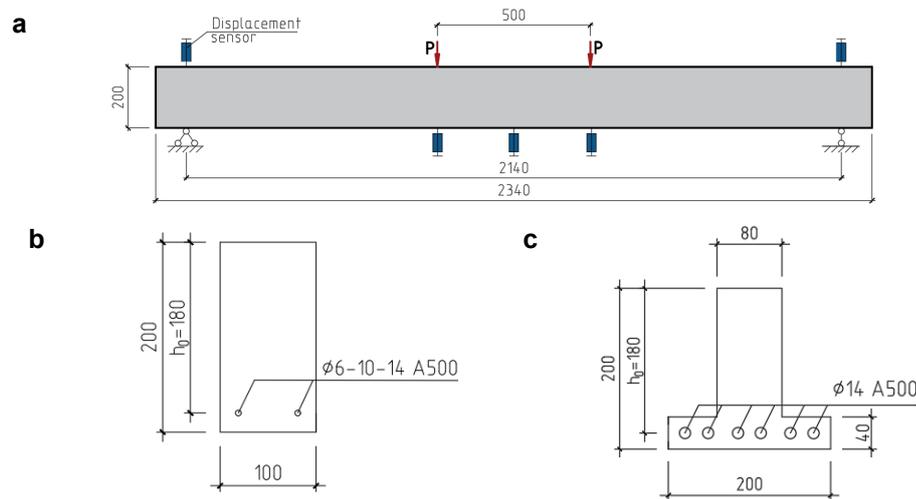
Side view of the beams, their loading scheme (a), cross-sections of rectangular (b), and T-shaped beams (c).
